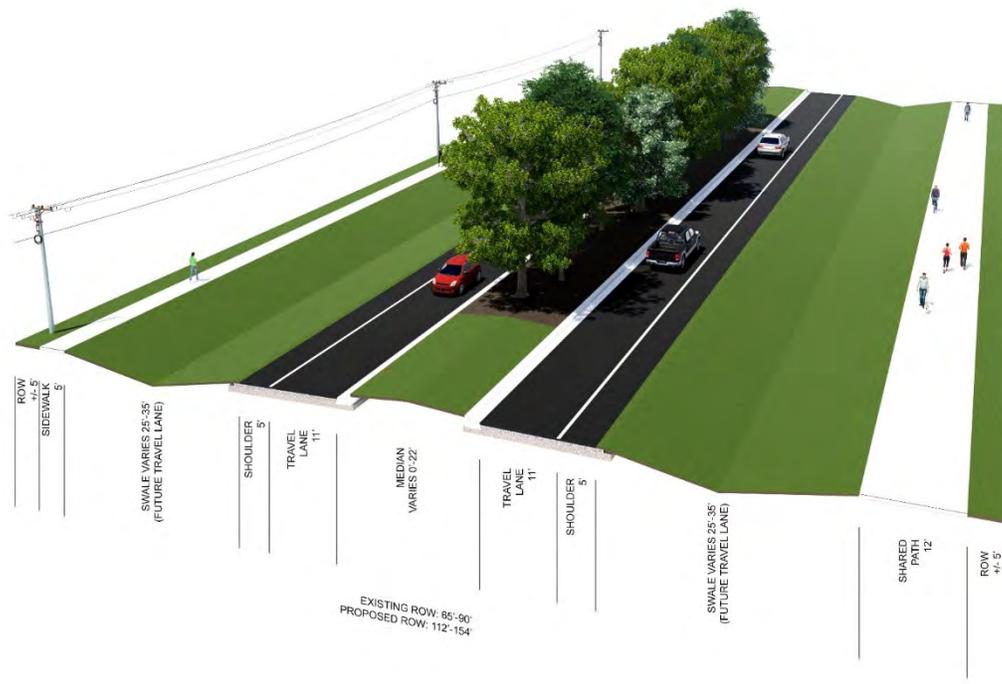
Springhill Road from Orange Avenue to North Lake Bradford Road Typical Section
